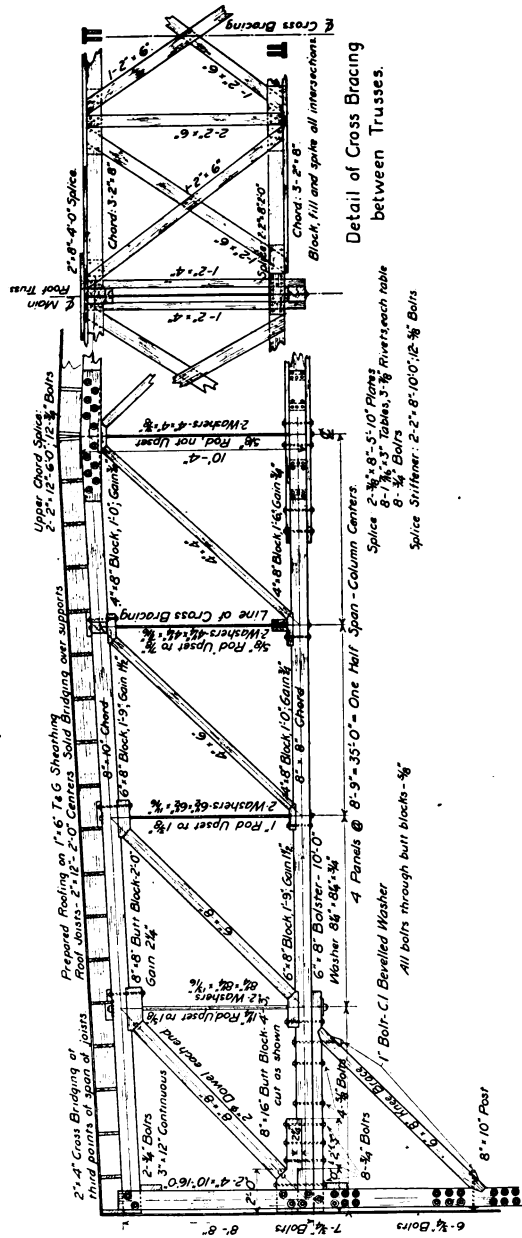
DETAIL OF HOWE ROOF-TRUSS.
